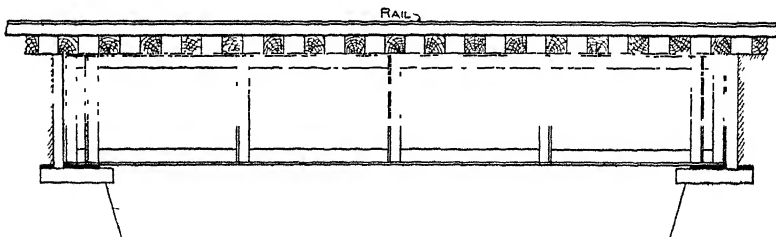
Side View of Deck Plate-Girder Railway Bridge.
